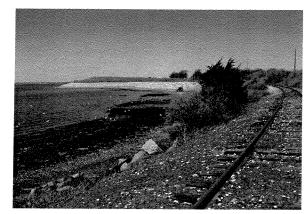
Newly capped McAllister Landfill with new riprap (white strip) located adjacent to the Subject Property.
